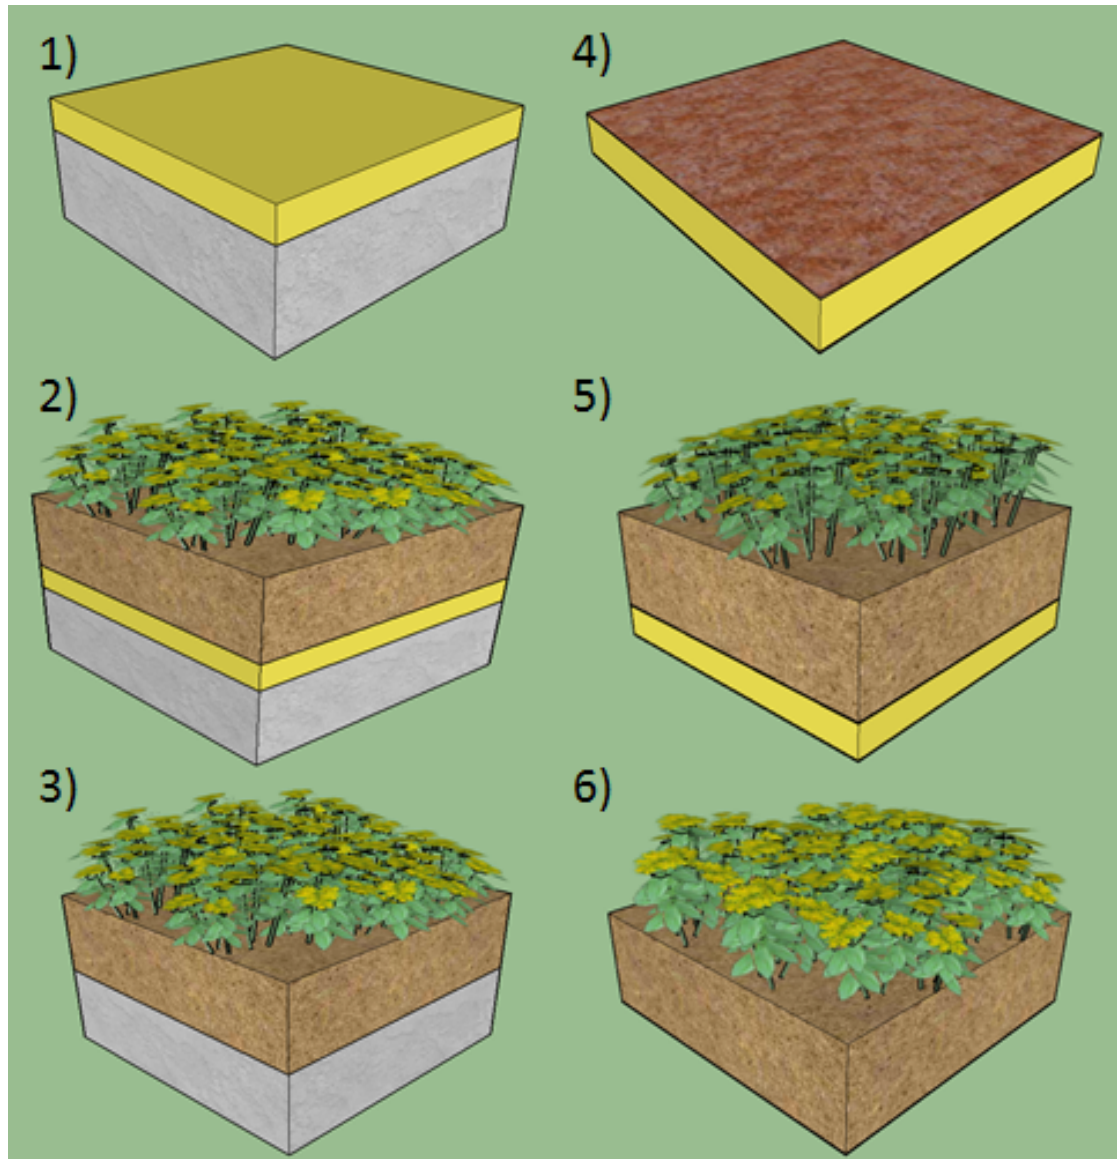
Traditional roofing systems in retail stores: 1) Insulated concrete slab, 4) Insulated metal deck. Vegetated roofing systems: 2) Vegetated roof upon an insulated concrete slab, 3) Vegetated roof upon an uninsulated concrete slab, 5) Vegetated roof upon an insulated metal deck, 6) Vegetated roof upon an uninsulated metal deck
